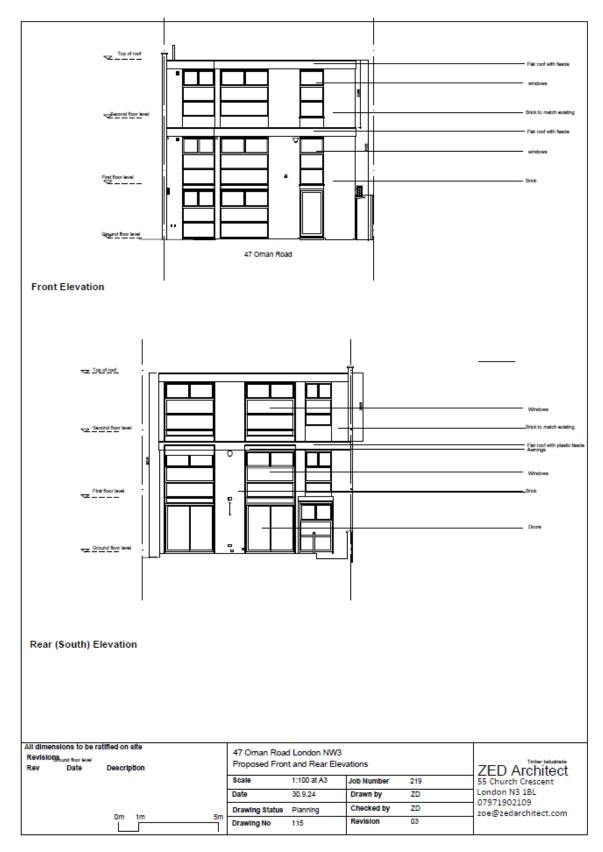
Proposed front and rear elevations (Source: submitted drawings)
